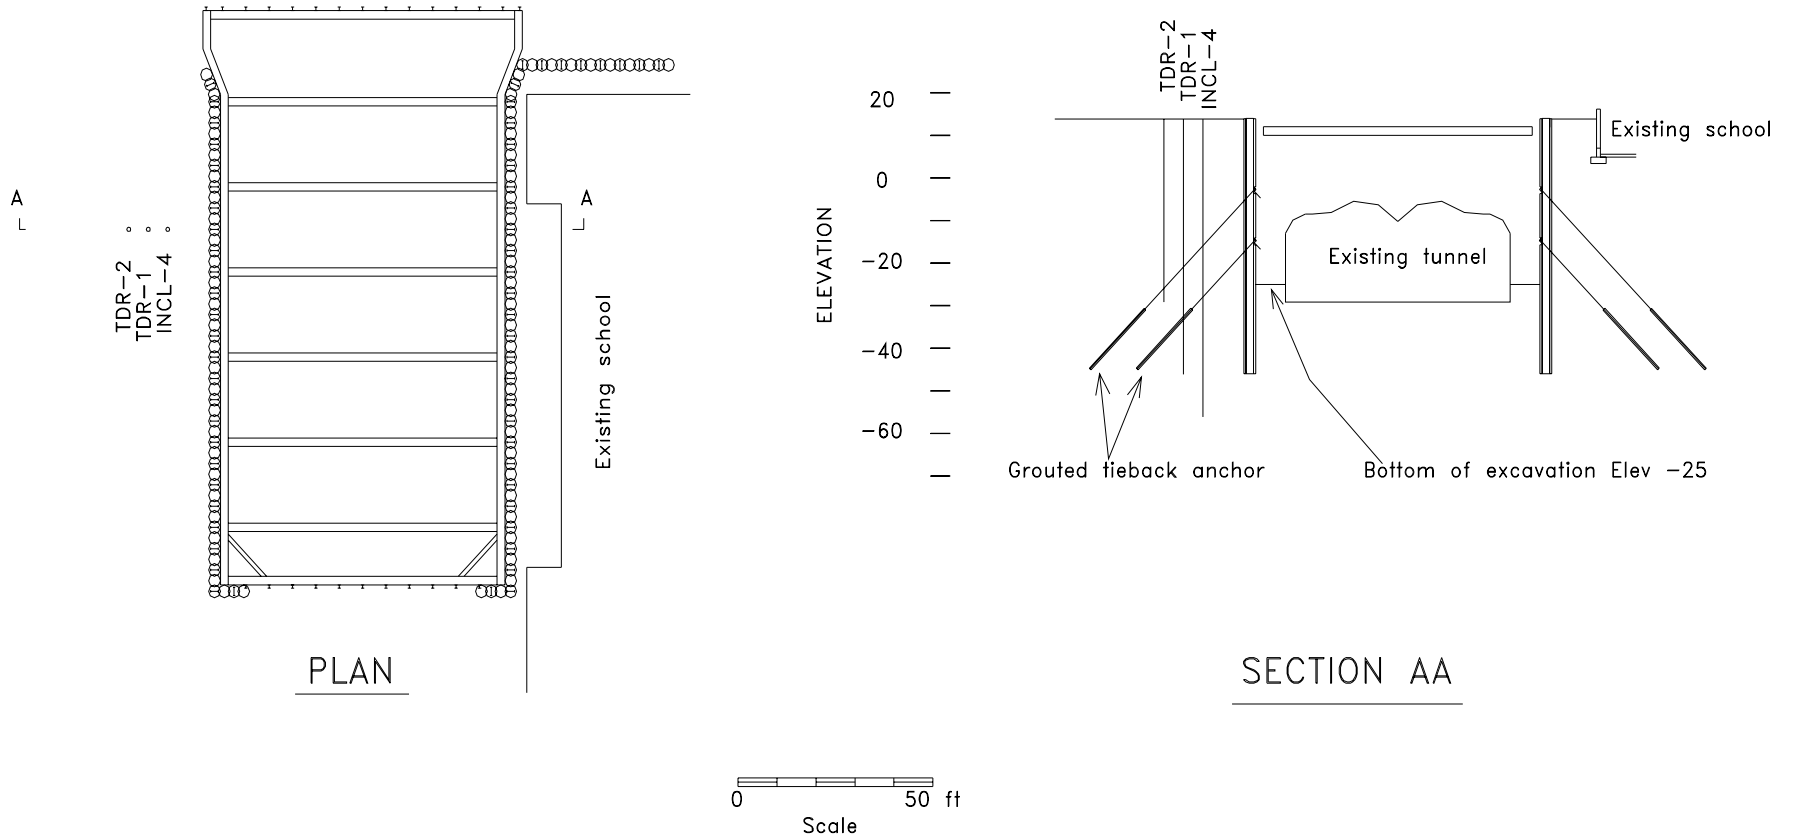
Plan view and cross section of the Chicago and State subway excavation, Chicago, Illinois.
